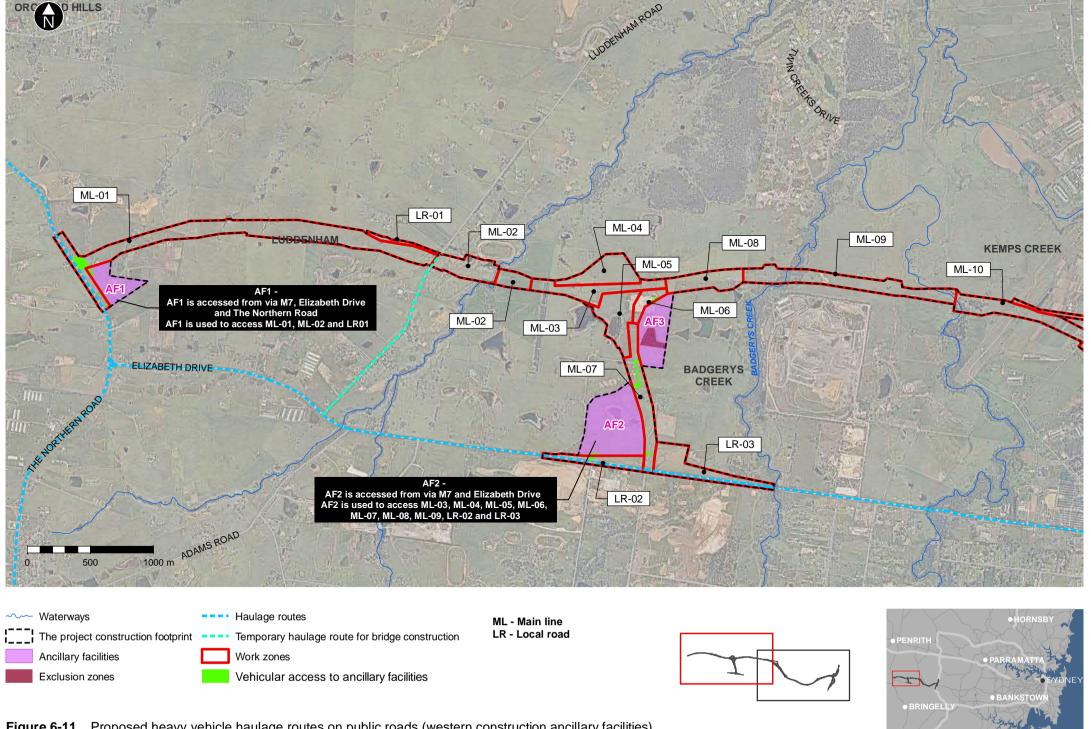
Proposed heavy vehicle haulage routes on public roads (western construction ancillary facilities)
